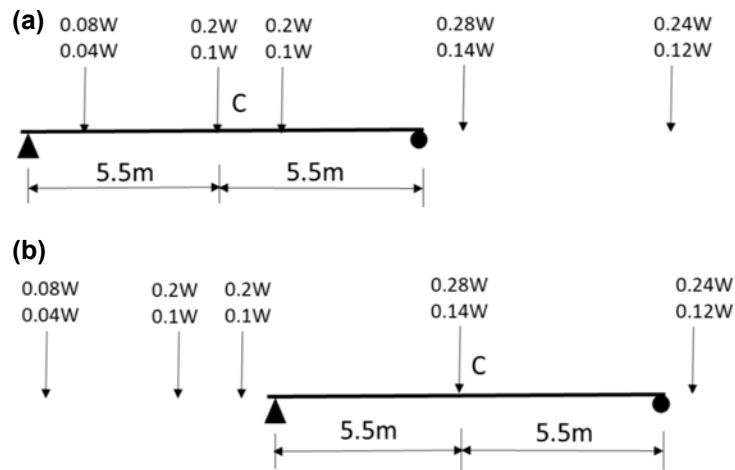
18: possible critical midspan moment cases using truck load (a) first three axle numbers of the truck are on the bridge girder (b) the heaviest axle (no.4) is located at midspan of the girder (Huang, 2020).
